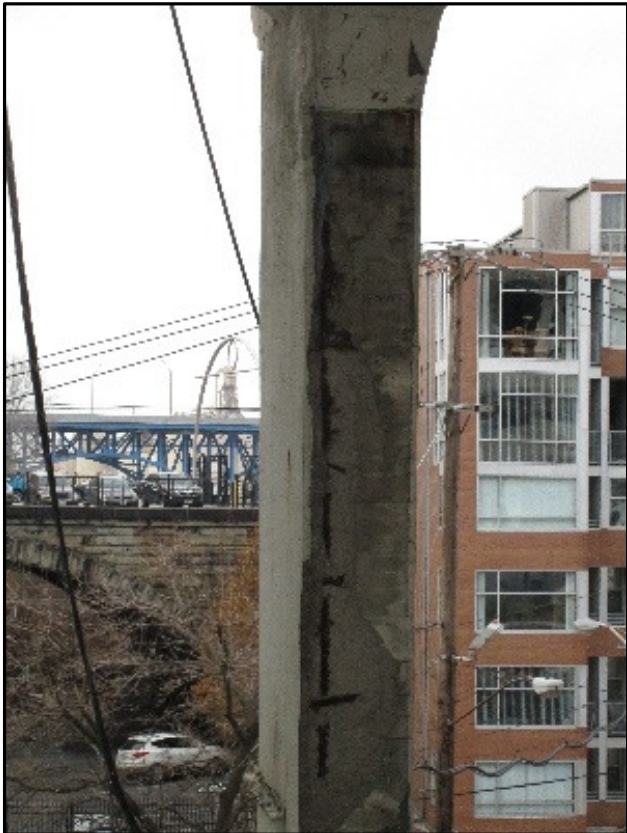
Sound 1996 Shotcrete Patch & Fractured Original Concrete,
